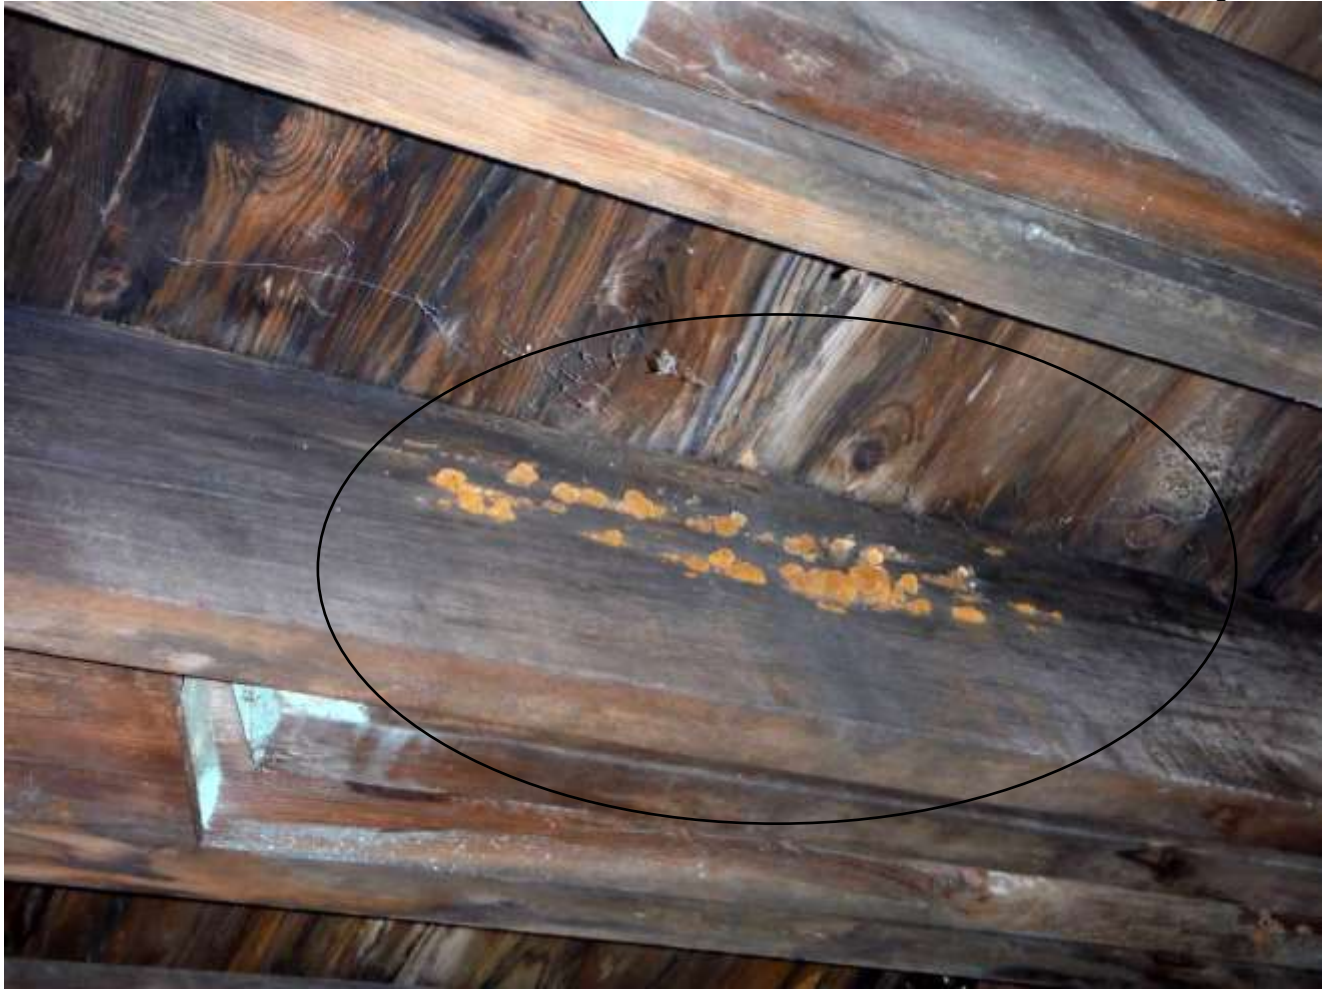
Orange mold-like substances on roof structure; water damaged/rotted/mold-like. Roof have severe water damage; recommend a building contractor evaluate roof structure and roof for tear off/replacement, gutters, ventilation and extent of structural damage & repairs.
